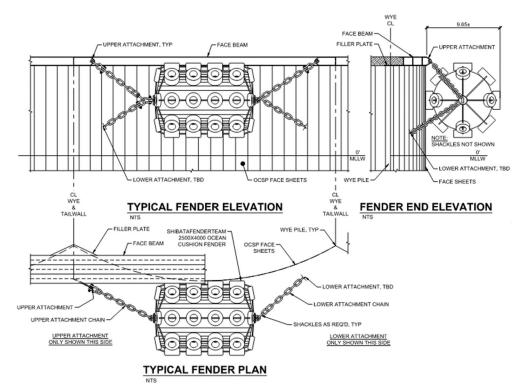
Removable Foam Filled Fender – Plan and Elevation Views
